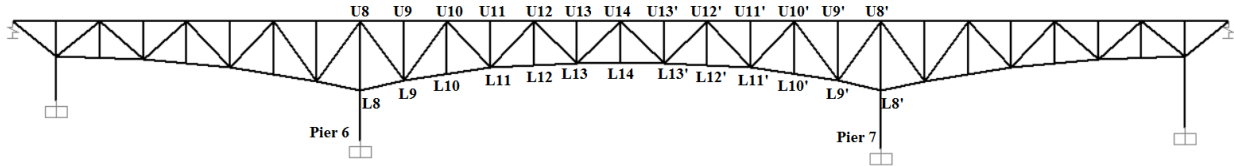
Elevation view of main truss structure of I-35W Bridge
